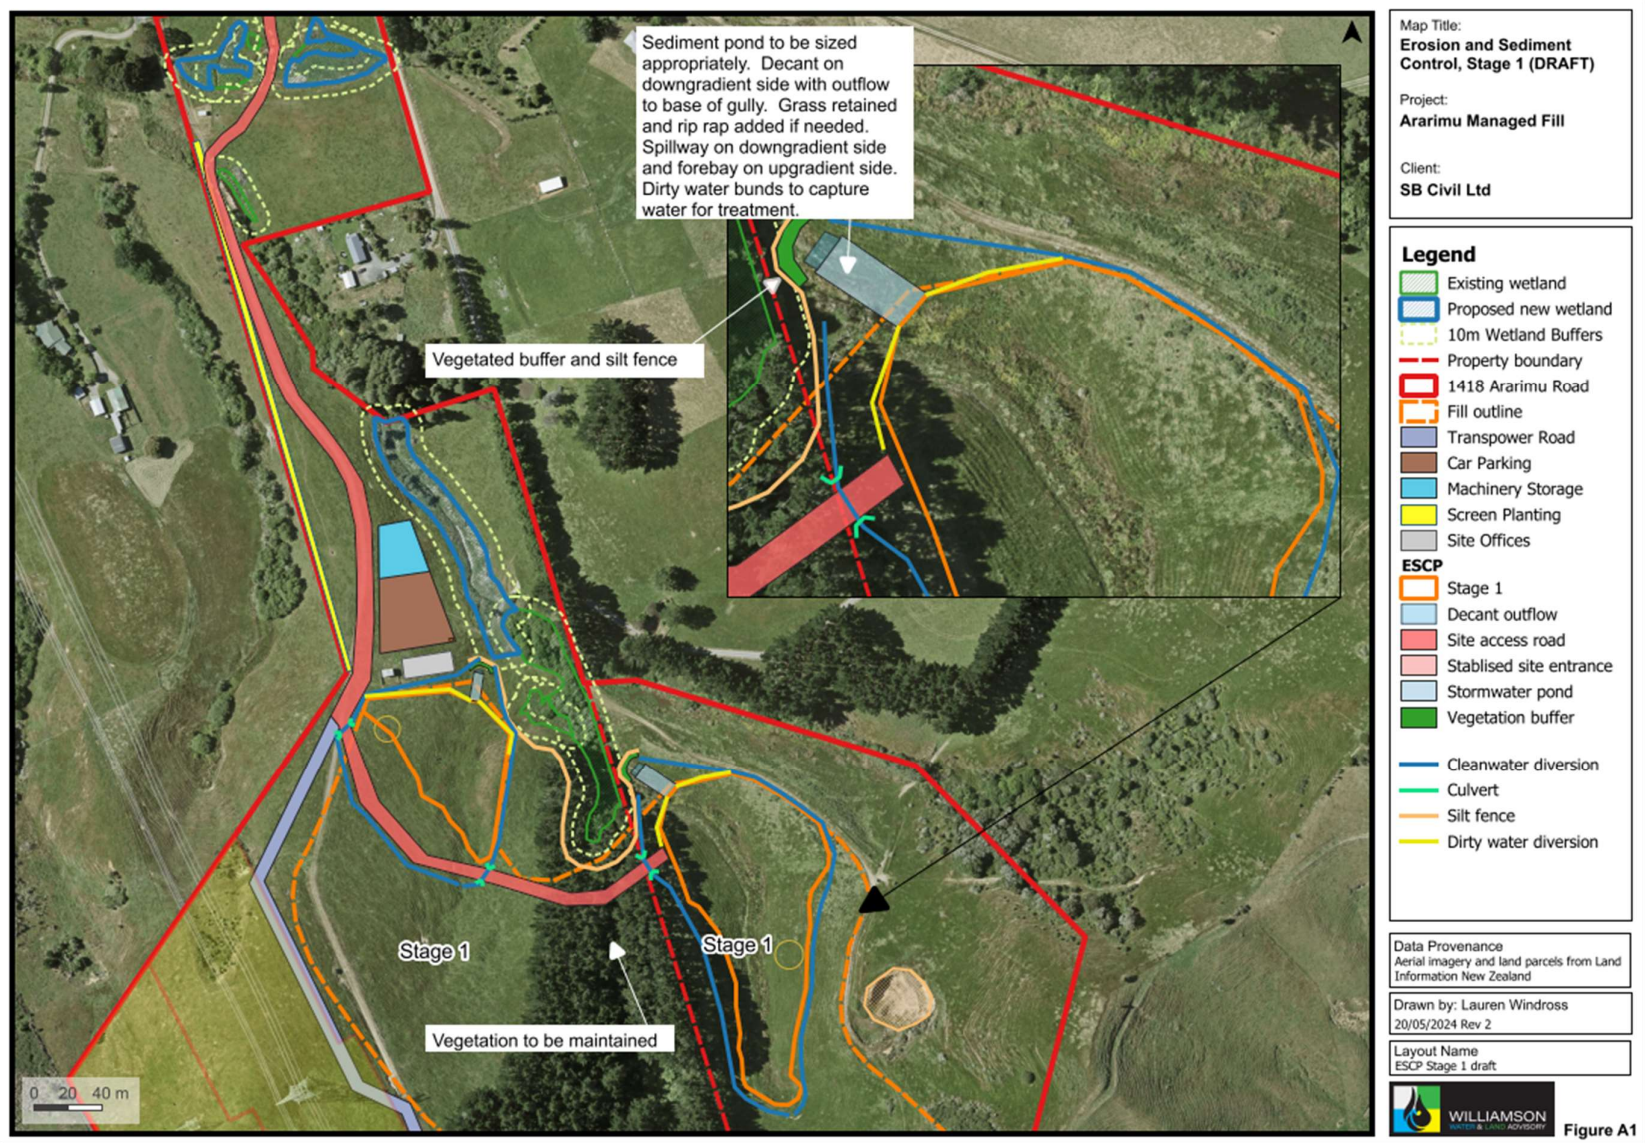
Erosion and Sediment Control Plan for Stage 1 of the proposed development.
